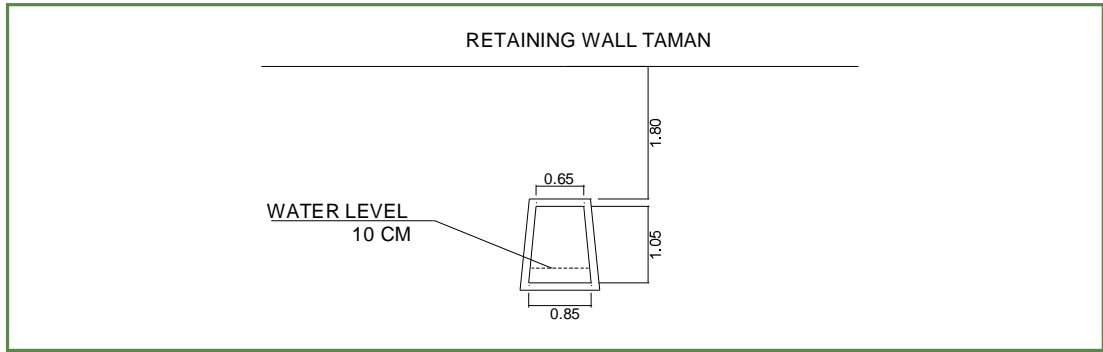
DETAIL OF BOX CULVERT-3 (TAMBORA AREA-1)
